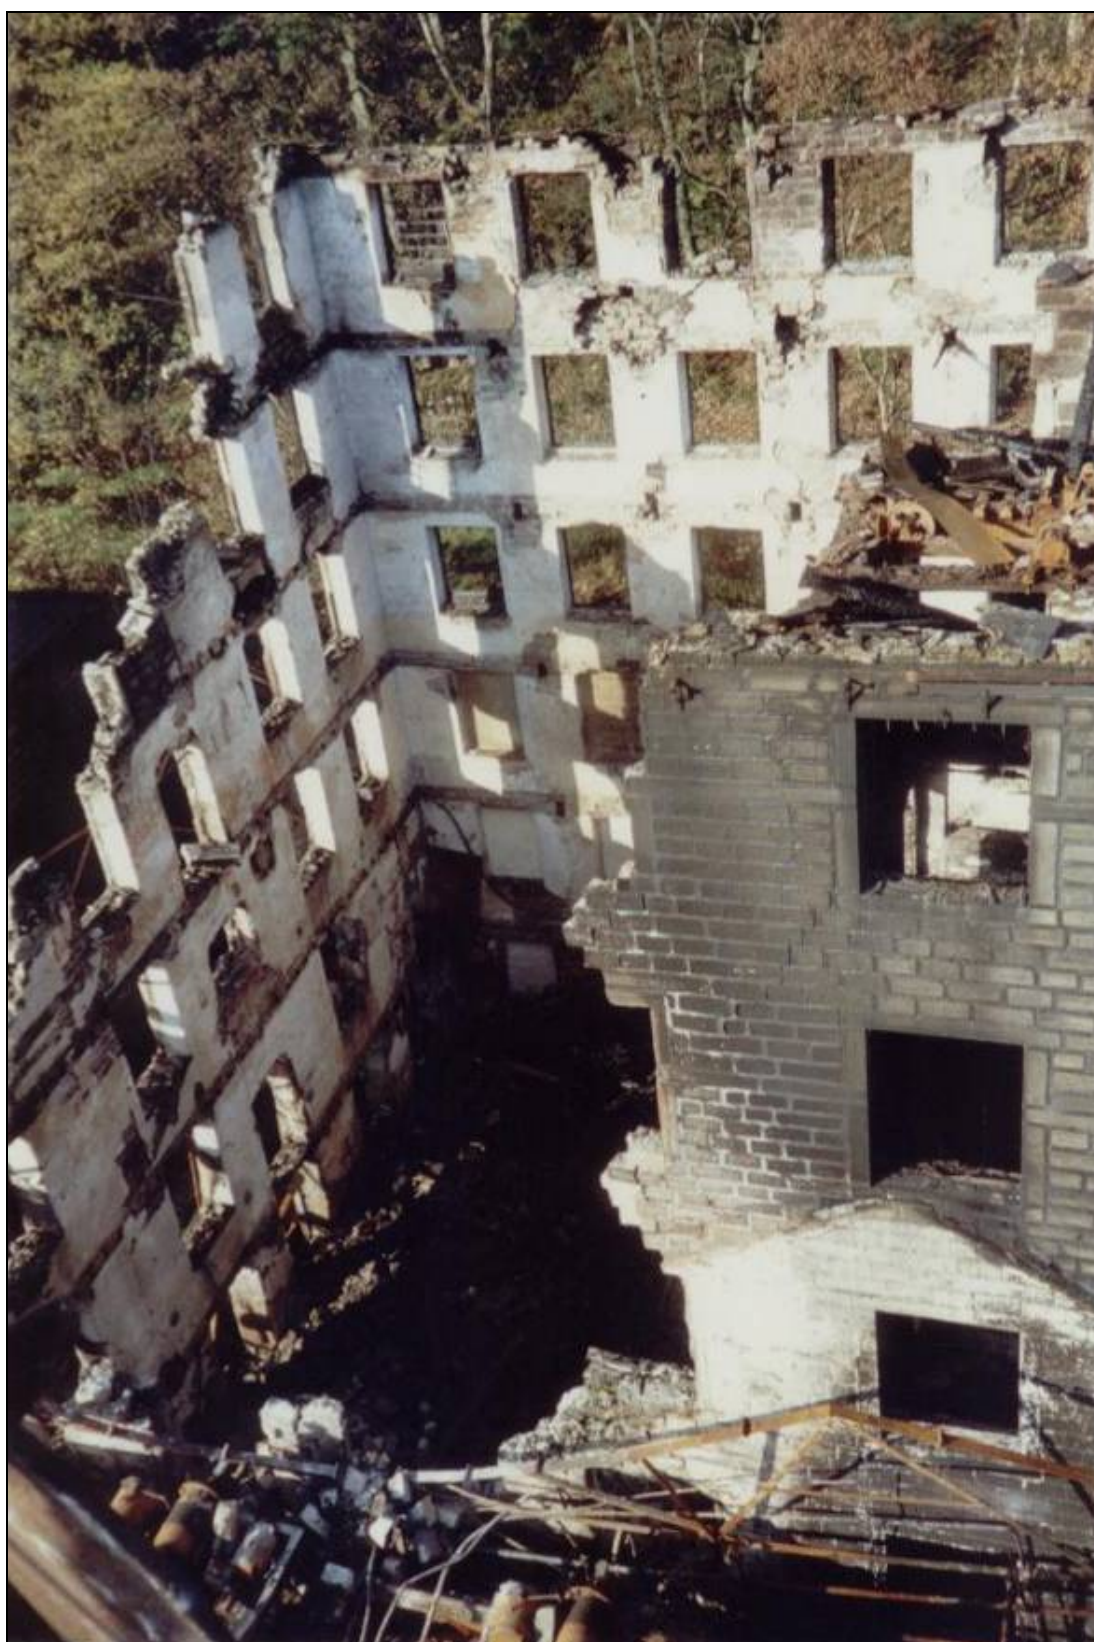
Interior faces of northern and western walls of building 1, showing position of windows and floor scars (© David Brown1989)
